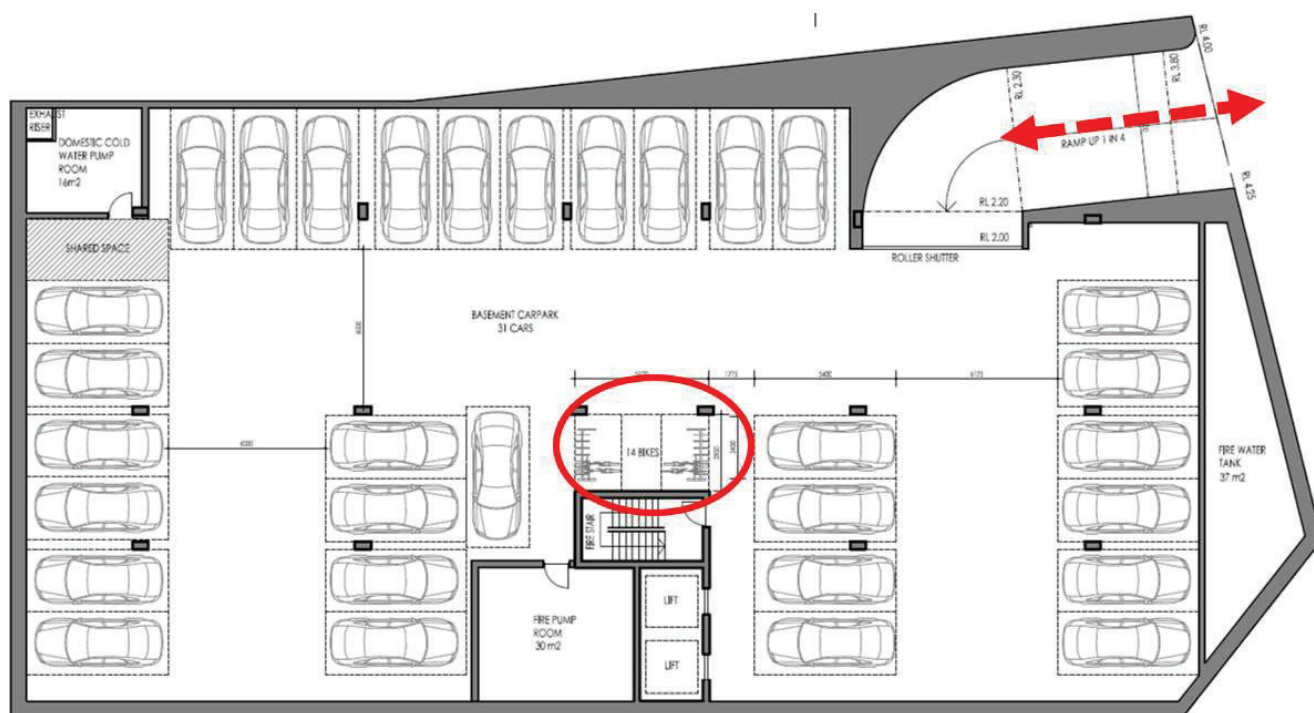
Proposed location of bike parking at basement level (source: Harris-Jenkins Architects)
